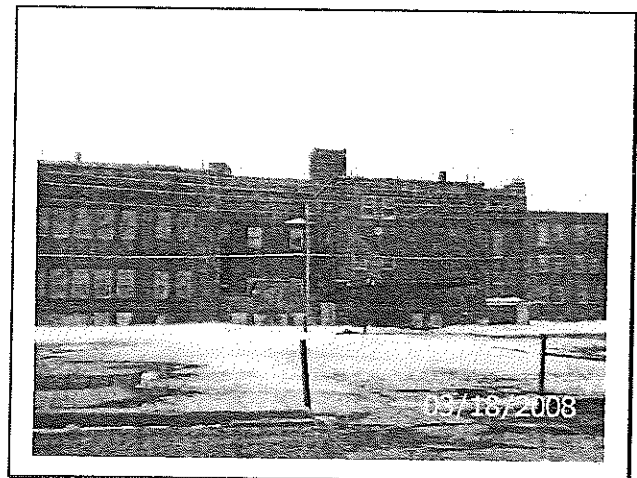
Viewing exterior of Rath Administration Building, looking North.
